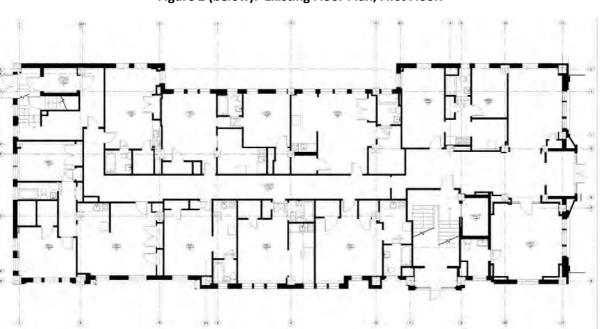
(above): Existing Floor Plan, Basement. Figure 2 (below): Existing Floor Plan, First Floor.
